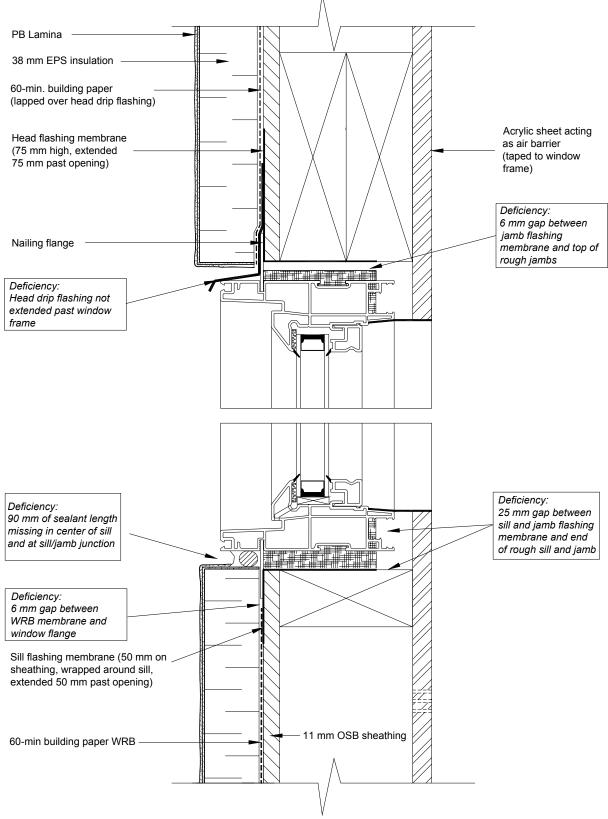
Wall/window interface for specimens No. 7 - vertical section
